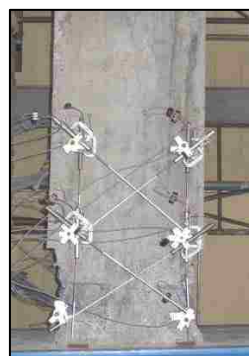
(F6 & F7) Longitudinal Bar Buckling and Crushing of Core Concrete
